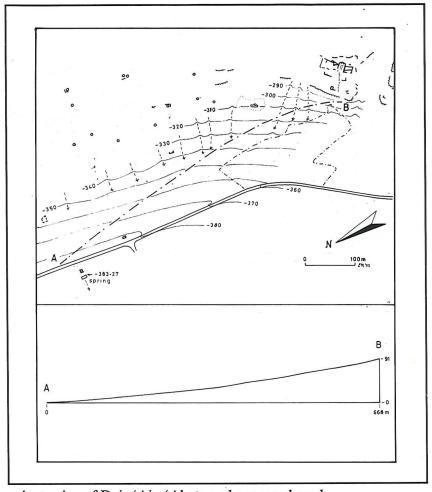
Plan of the ancient ruins of Deir 'Ain 'Abata and proposed road.
